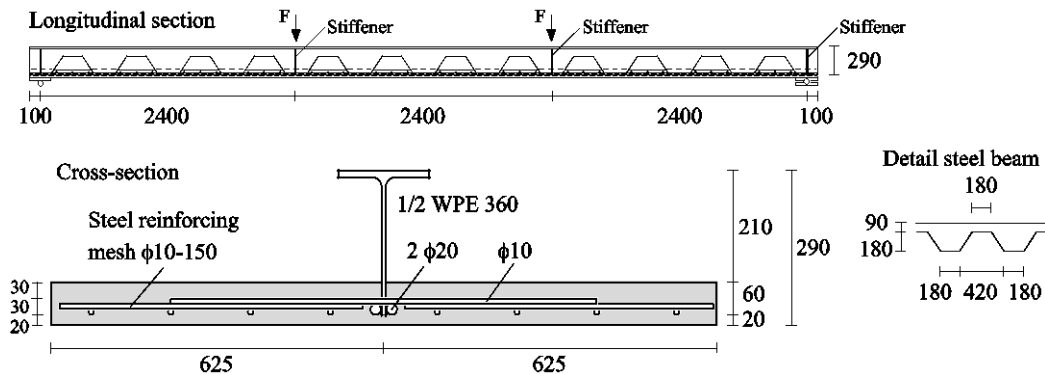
Steel-concrete composite beam with concrete slab on the bottom (“beam II”)
